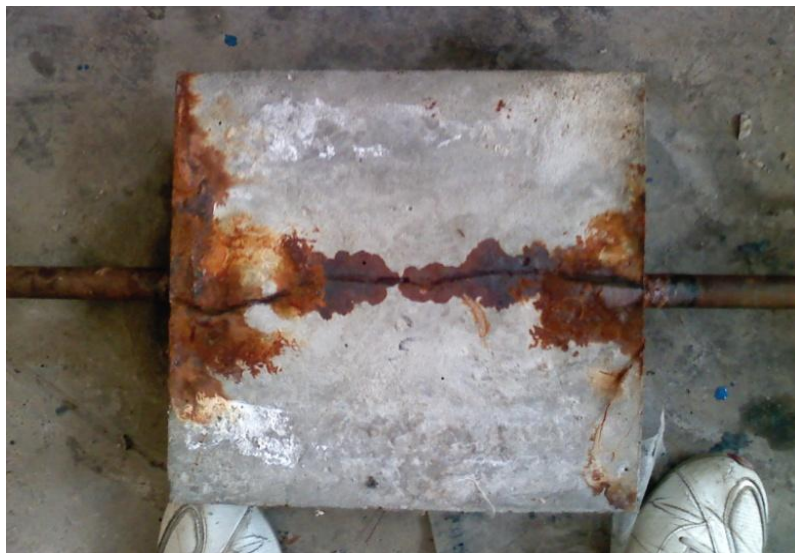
Longitudinal crack along the length of rebar
